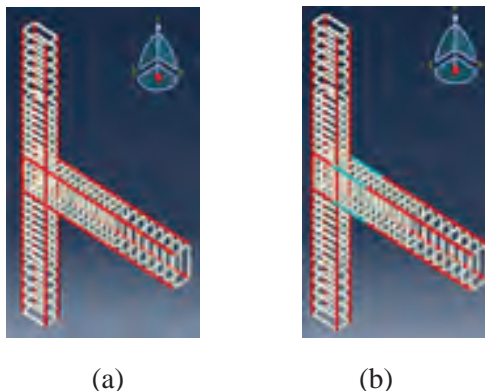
Reinforcement of BCJ with (a) steel and (b) SMA
